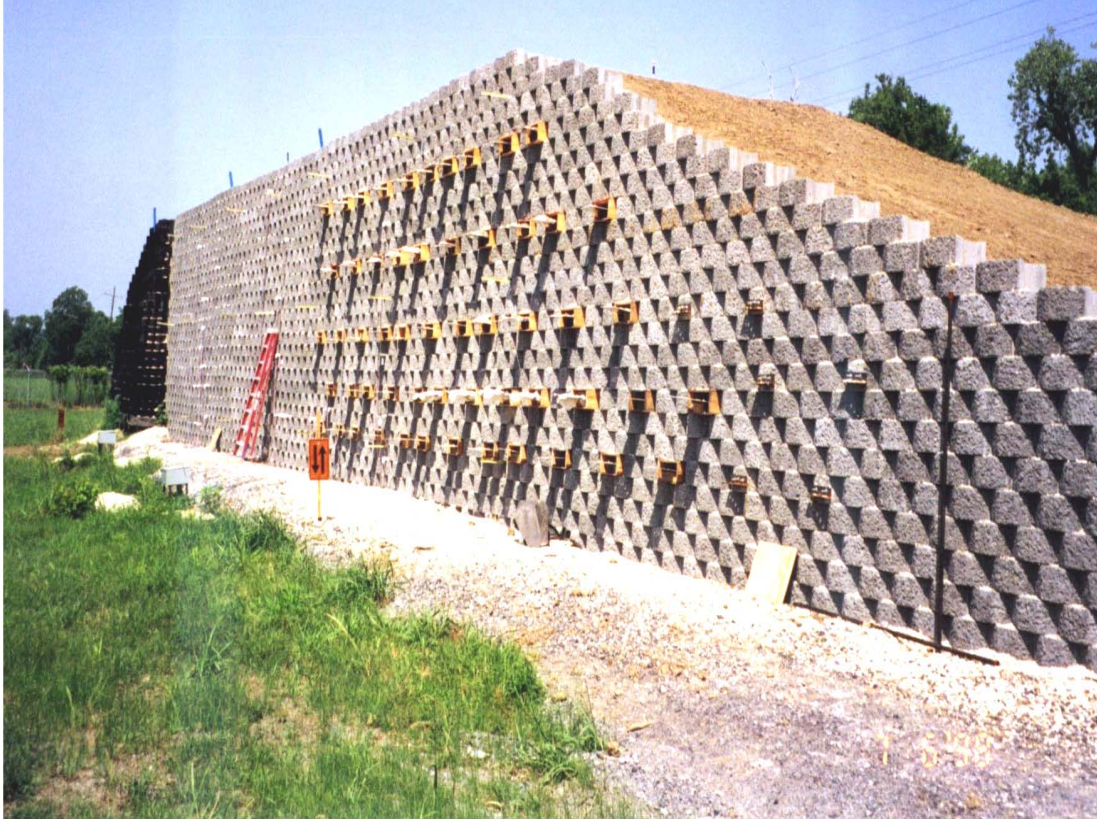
Elevation of LTRC test wall with the wooden pull-out test boxes.
